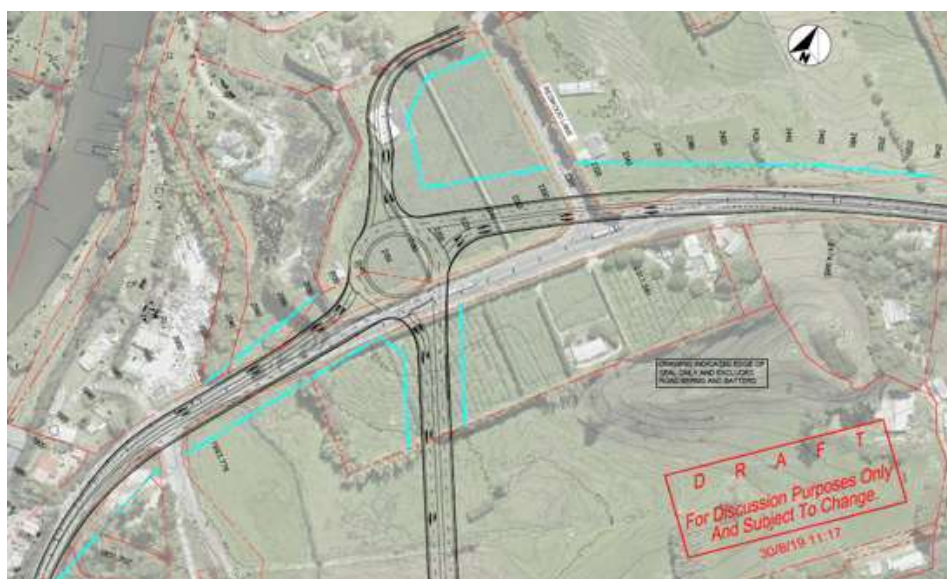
Option 1: Belk Road/Redwood Lane/SH29 Roundabout
